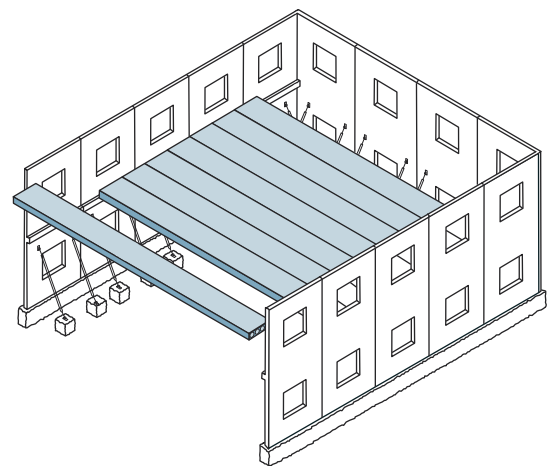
A two-storey precast concrete panel building (after Hughes^{7.12})
